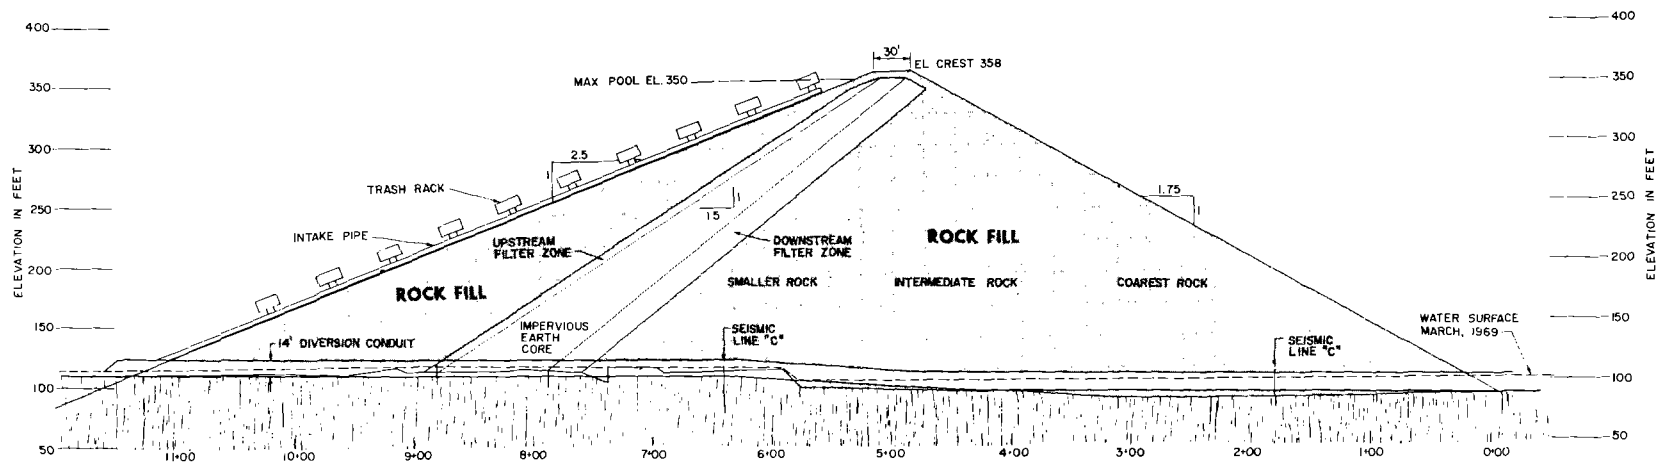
NORTH OROPOUCHE DAM TYPICAL PROPOSED SECTION
